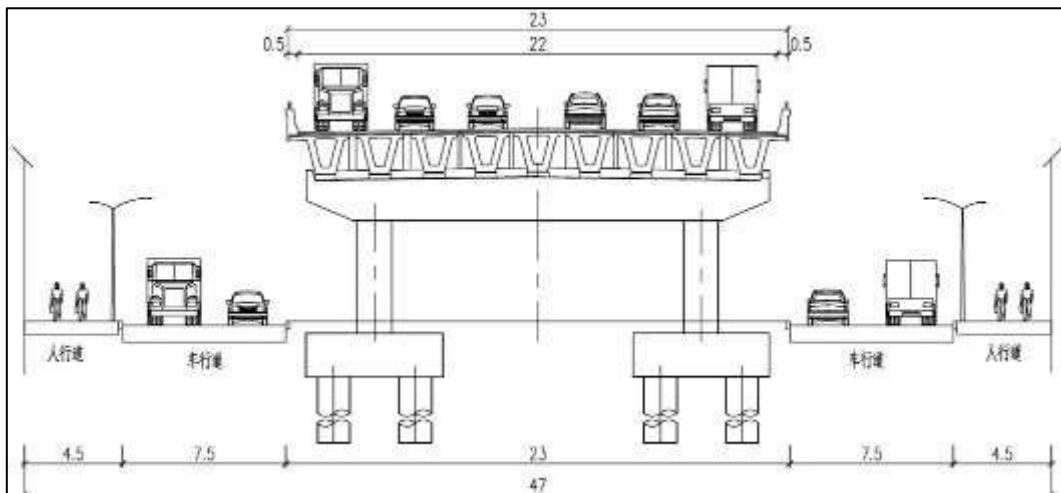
Cross-section of Xinxing Avenue Flyover approach road (SY)
